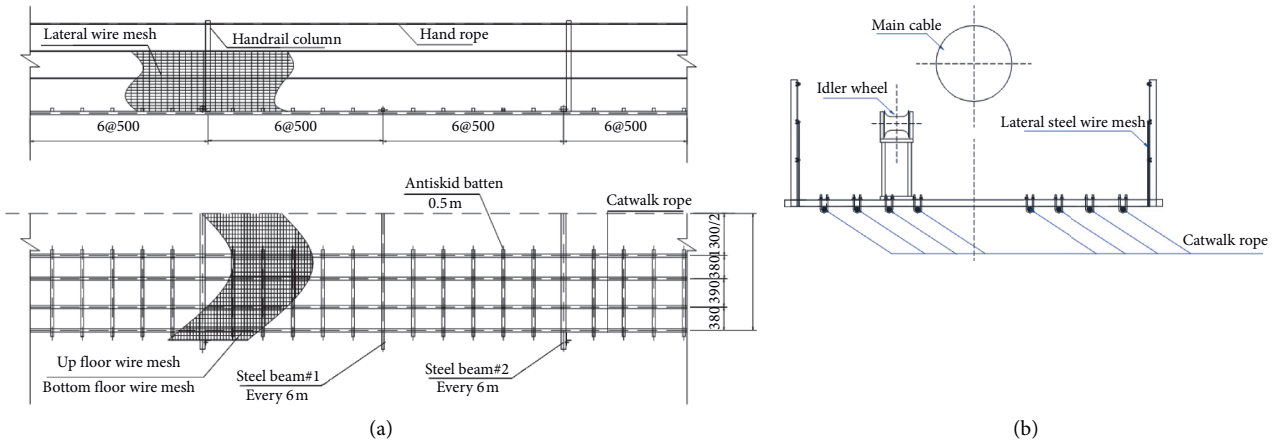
Detailed design of the catwalk section. (a) Elevation view and vertical view. (b) Lateral view.
